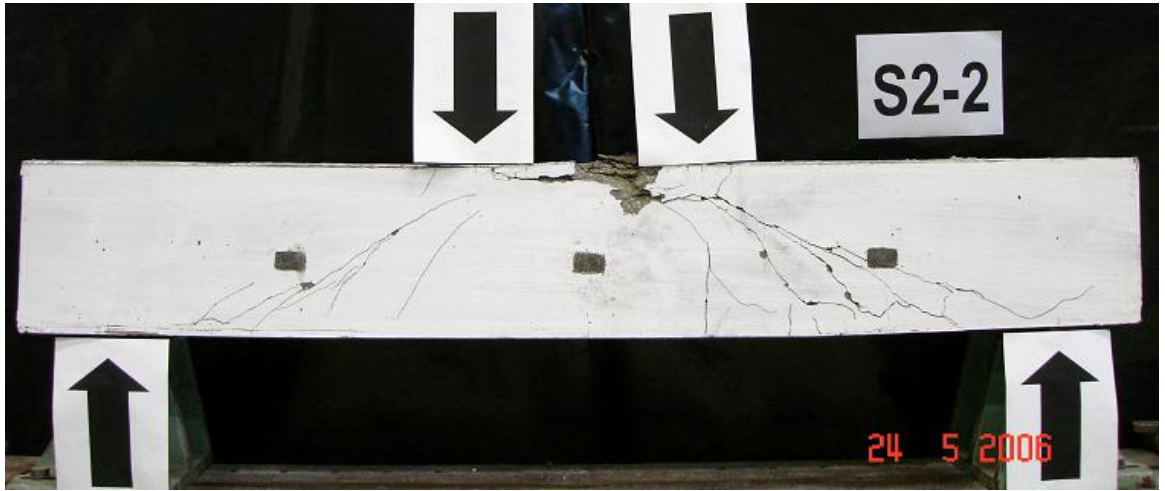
Overall Crack Pattern for Beam S2-2 (Front Face)
